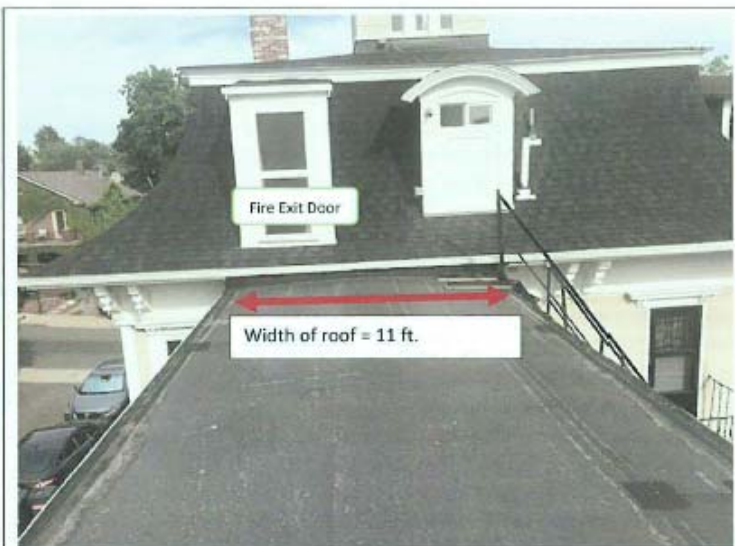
34 Spring St. Unit 4 Egress door and distance to fire escape stairwell!
